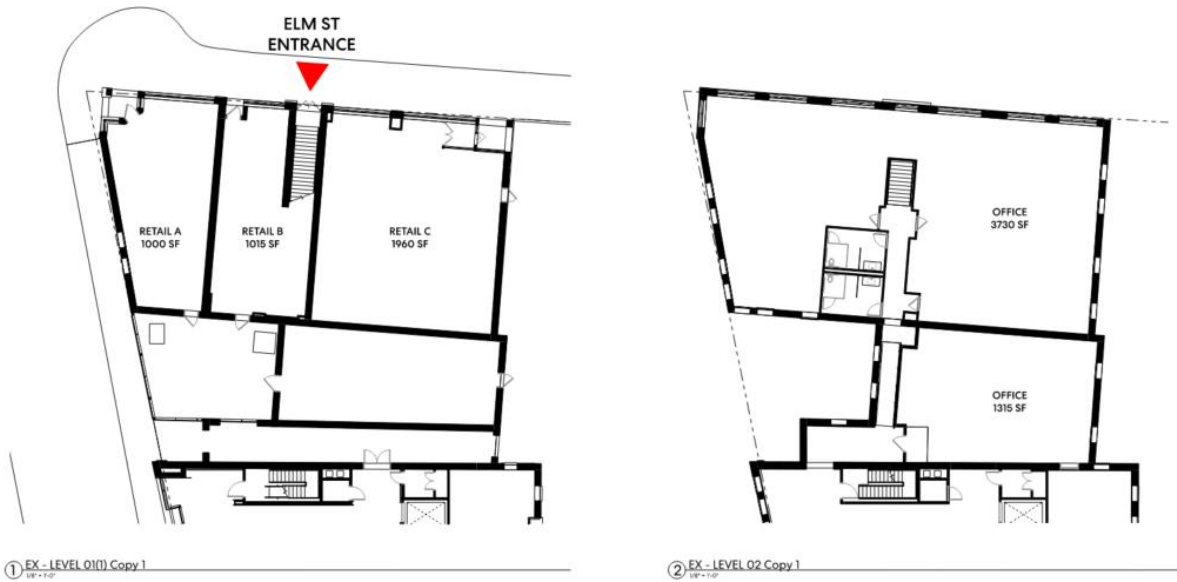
Elm Street Interior Stair and Tenant Retail Space Configuration
